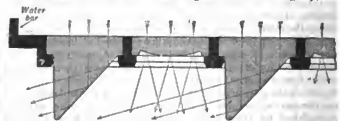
Section through Prism Pavement Light, the direction of light rays being indicated by arrows.
